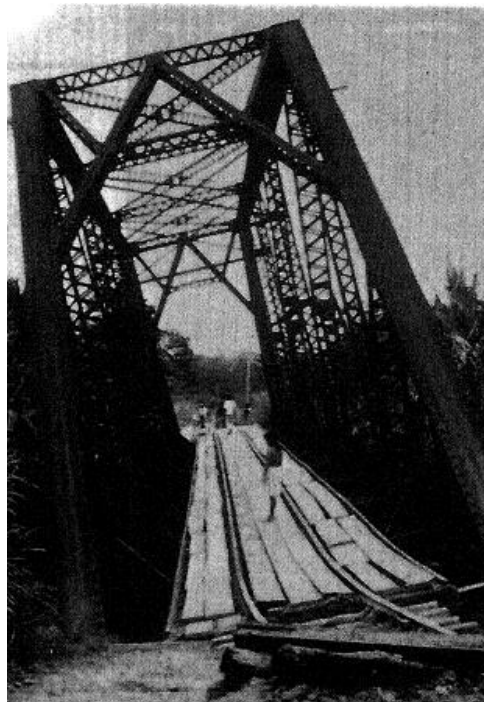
Tilting of Rio Bananito Railway Bridge due to caissons being pushed out from under bridge seatings (Youd et al. 1992)
